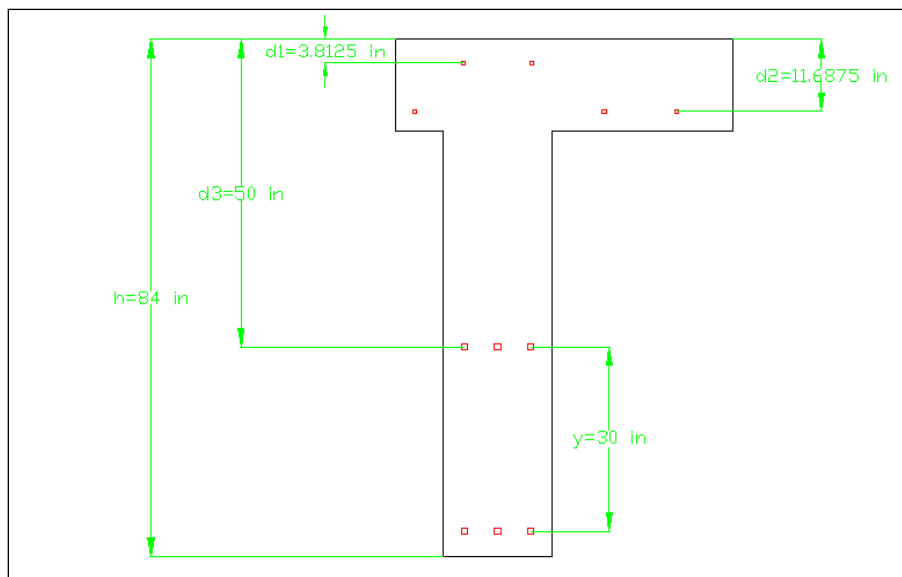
Distances of the steel rebar measure from the slab of the exterior beam.
